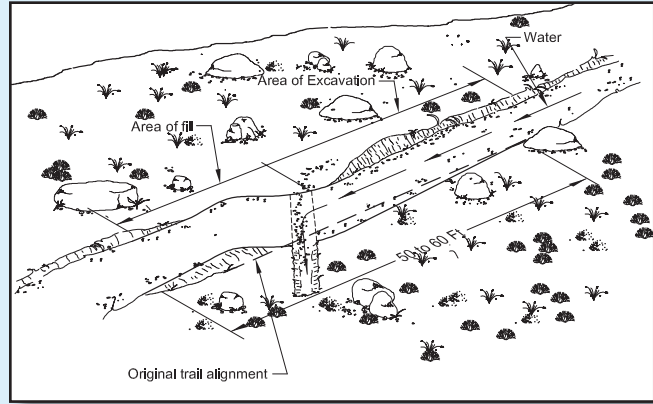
This drawing shows how to construct a rolling grade dip.
